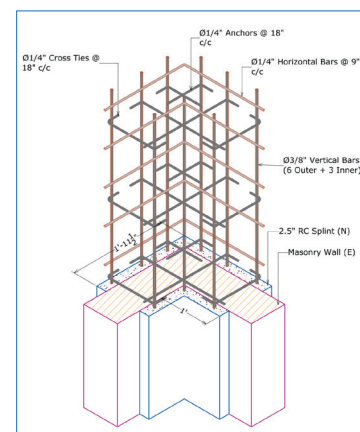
Vertical bar or mesh reinforcement in vertical belt at corners of rooms
